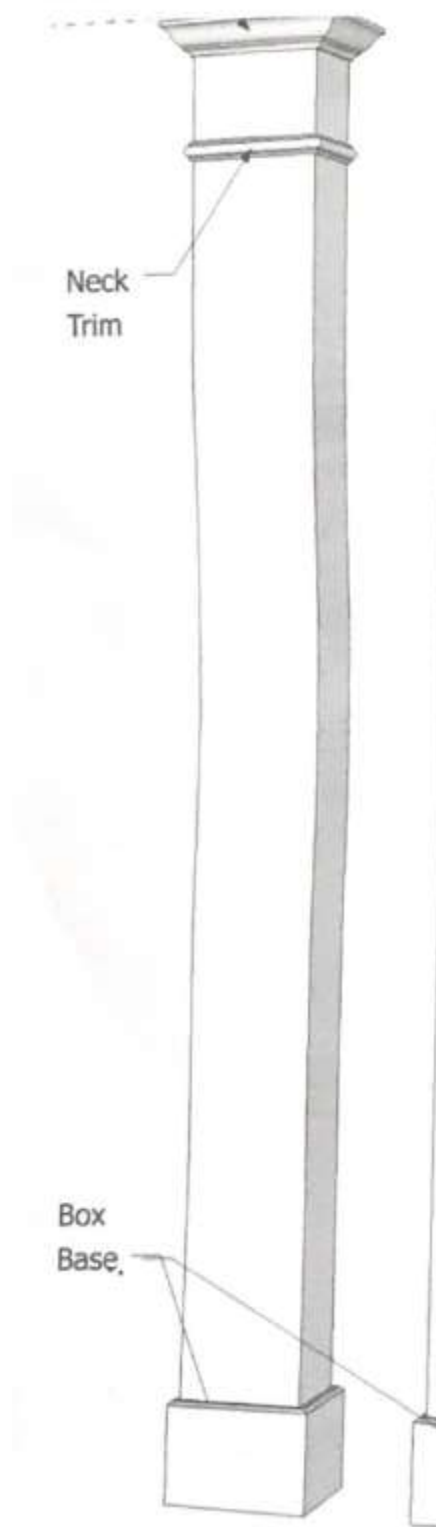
Image submitted as part of the Heritage Alteration Permit application for the property at 562 Maitland Street showing the proposed design of the porch posts.
